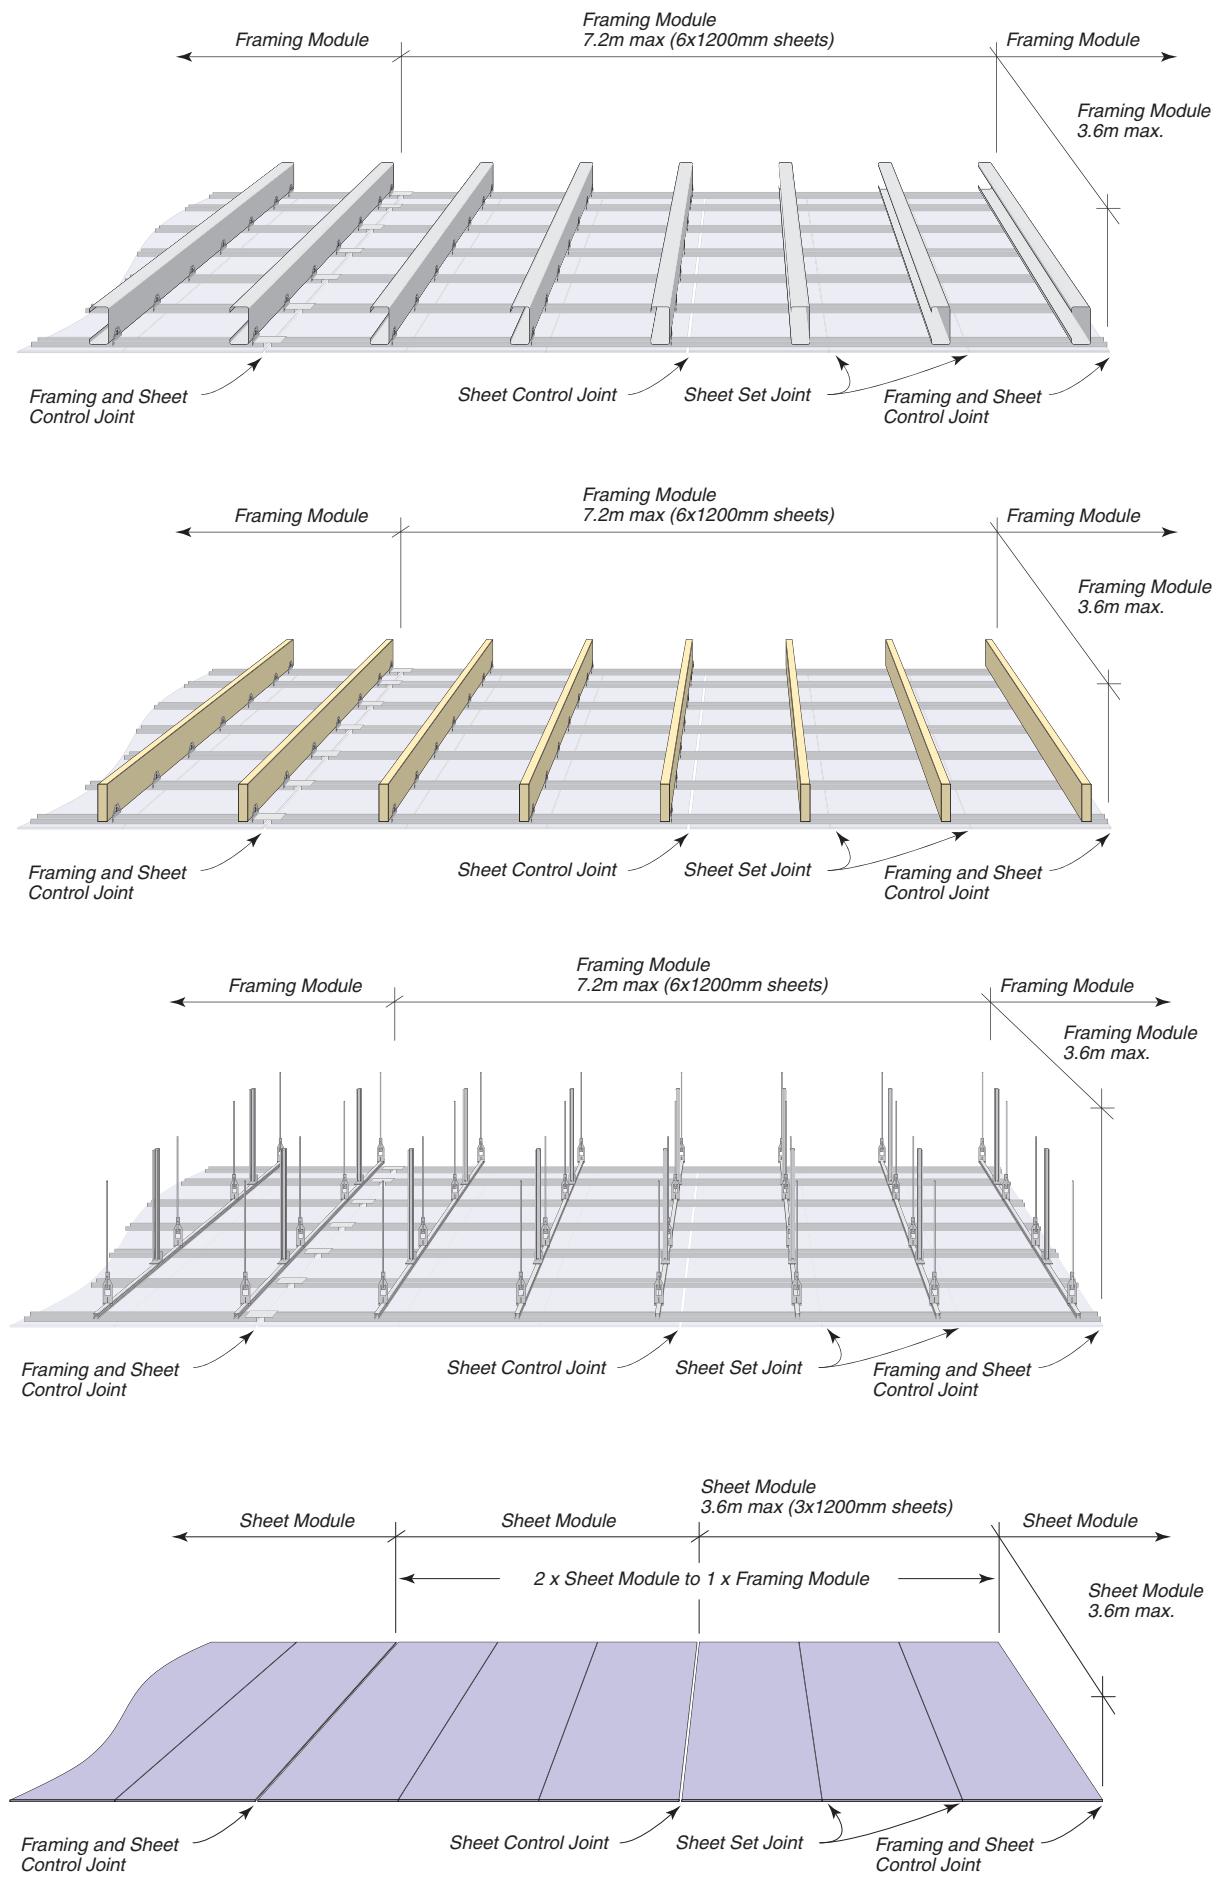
SoffitLine™ Ceiling System – Exterior Ceiling with Flush-Set Joints
